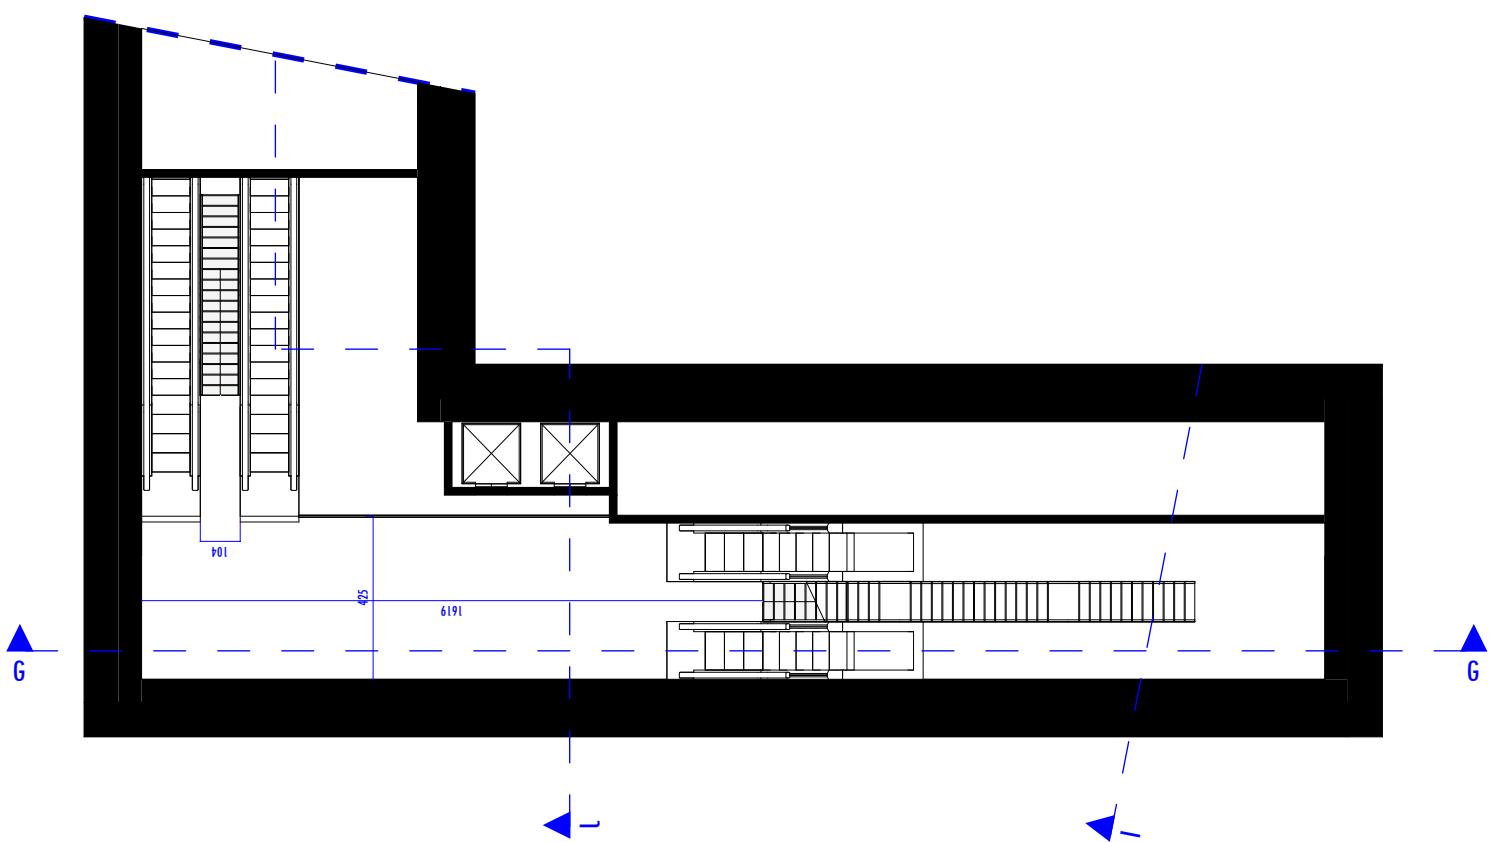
Mezzanino floor - Exit A to Piazza Magen David (-6.01m)
